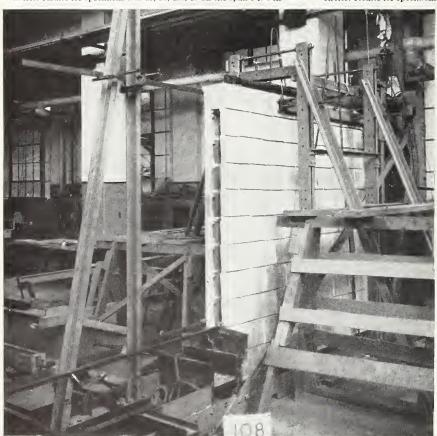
Wall specimen BE-R1 under racking load.
